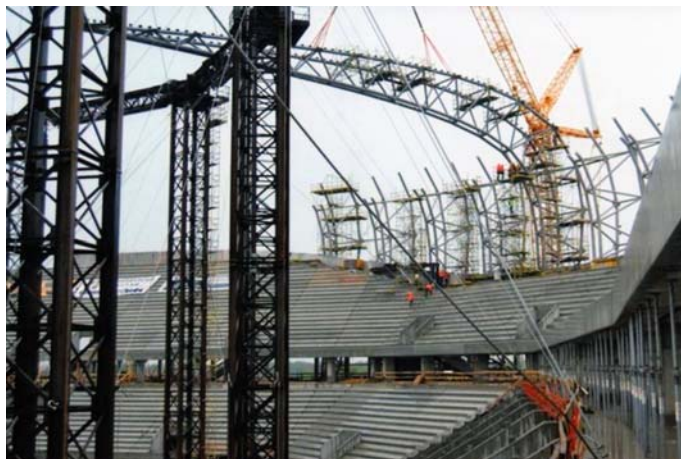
The first assembled “roof” section of a roof carrying girder(13.05.2010)
